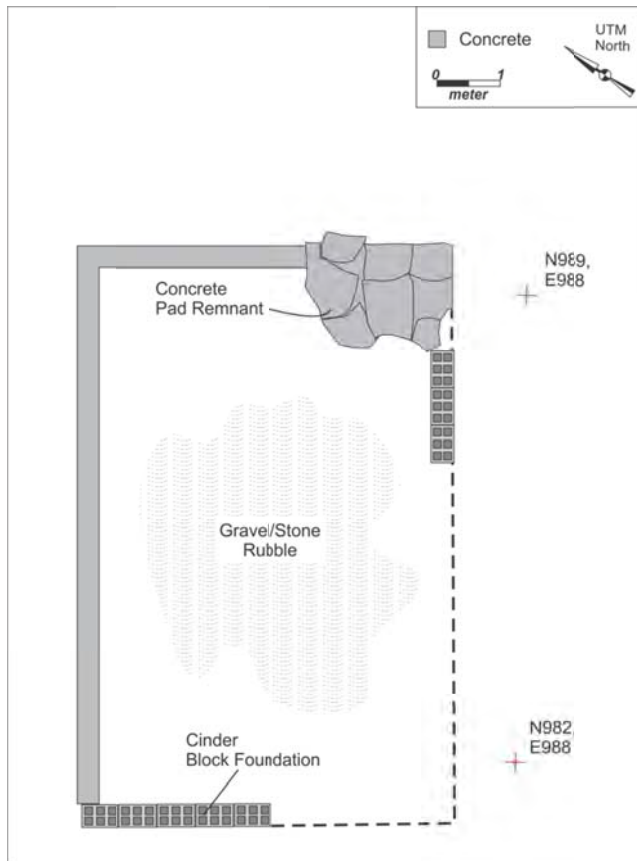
Stockdale Road Dairy garage (Structure #7) foundation.
